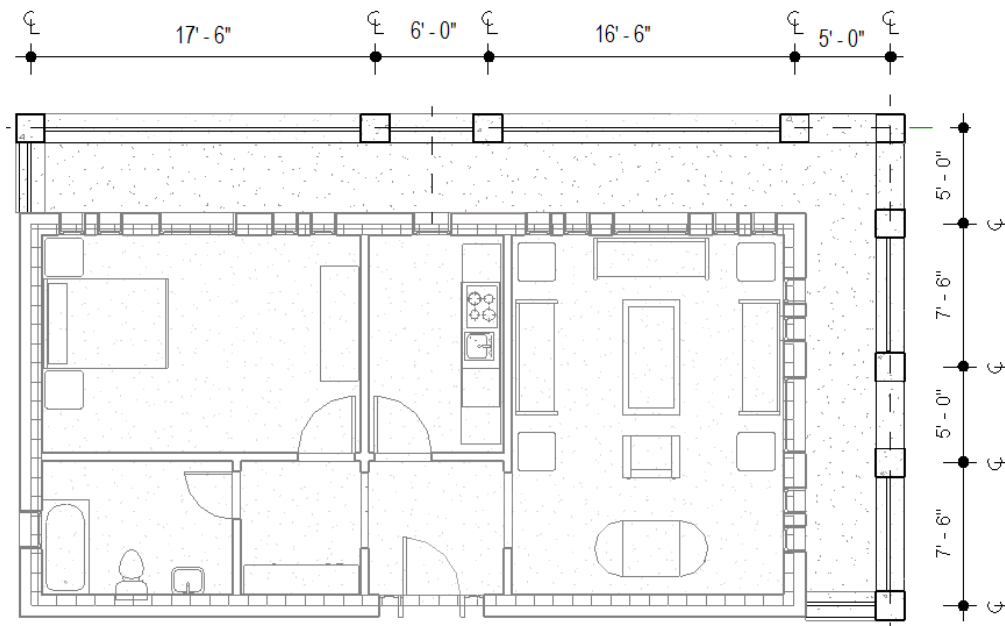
The sketch plan for creating structural elements for Design Option 1
